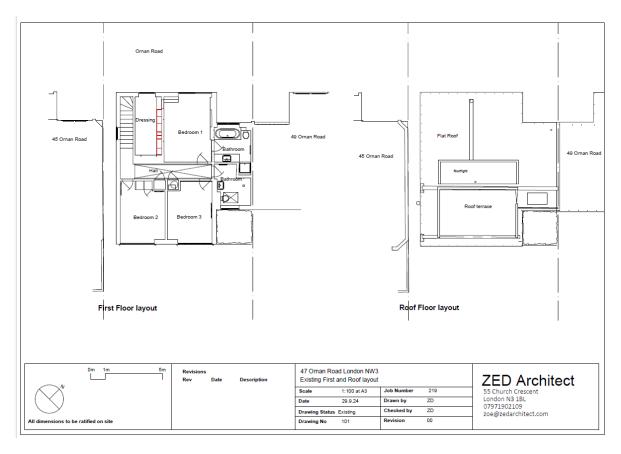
Existing first floor and roof plans (Source: submitted drawings)
